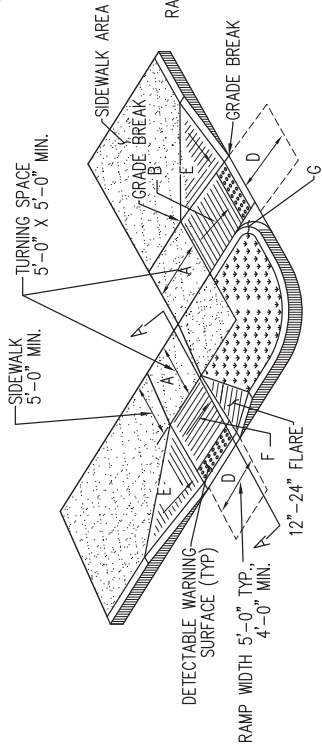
DETAIL B - DUAL PERPENDICULAR CURB RAMP
